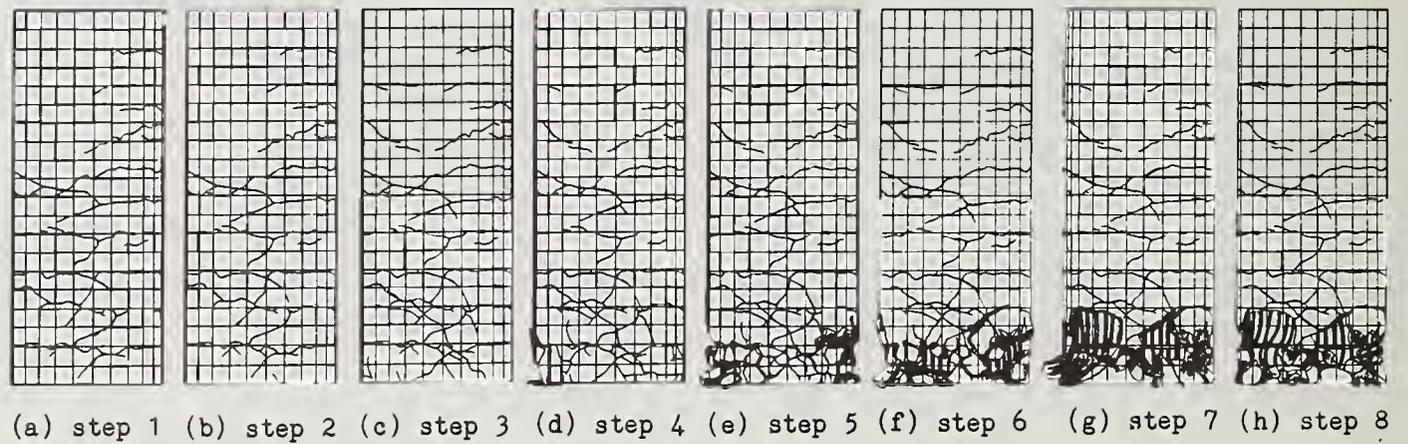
Failure Mode for Specimen with Circular Hollow Section (P-46)
